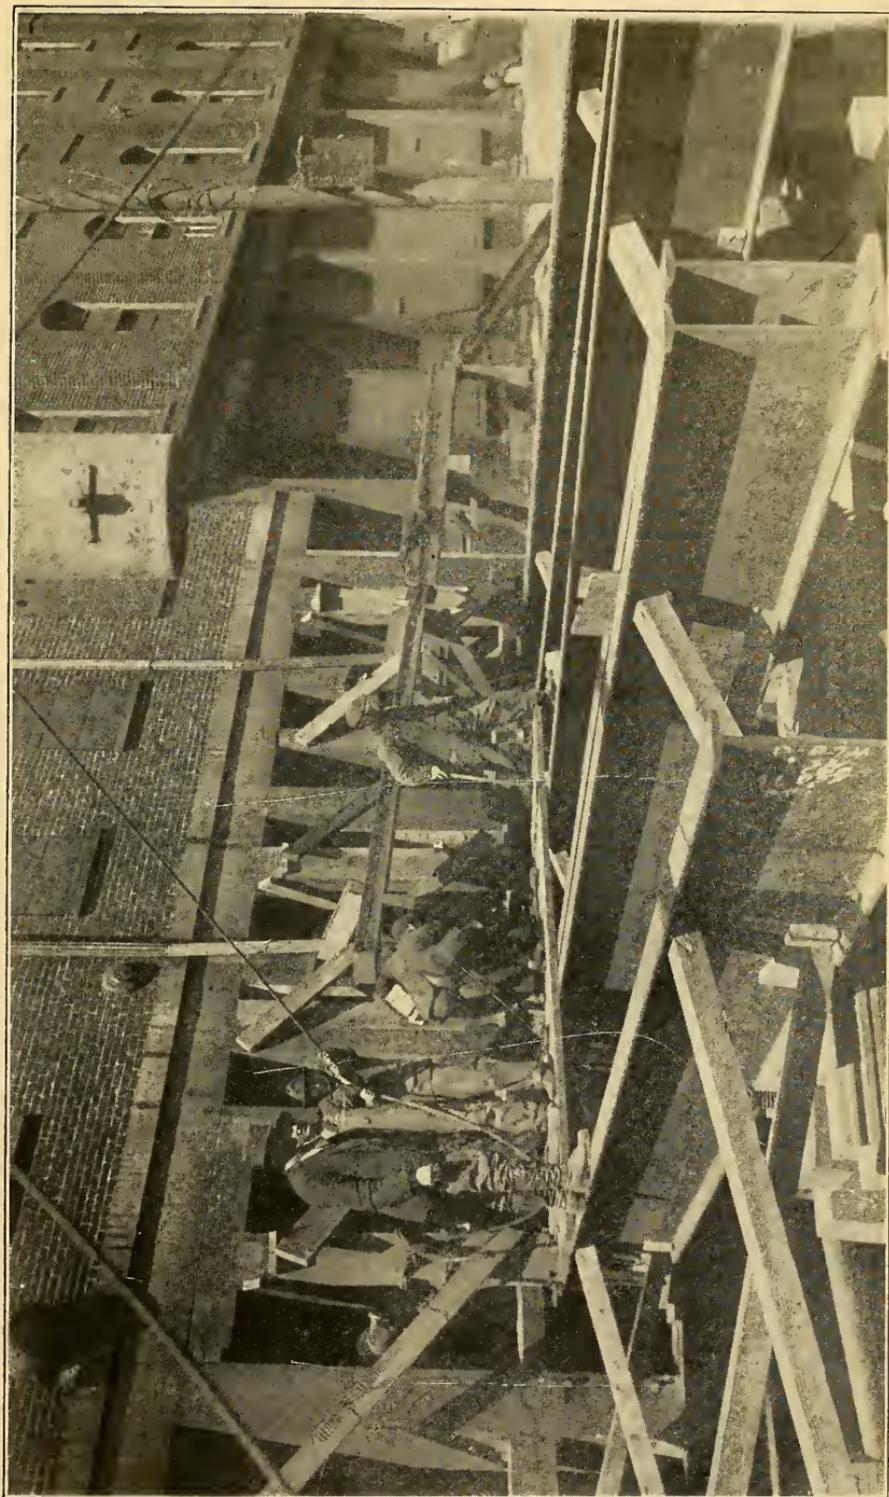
TEMPORARY SUPPORT FOR BUILDINGS — LEWIS STREET
